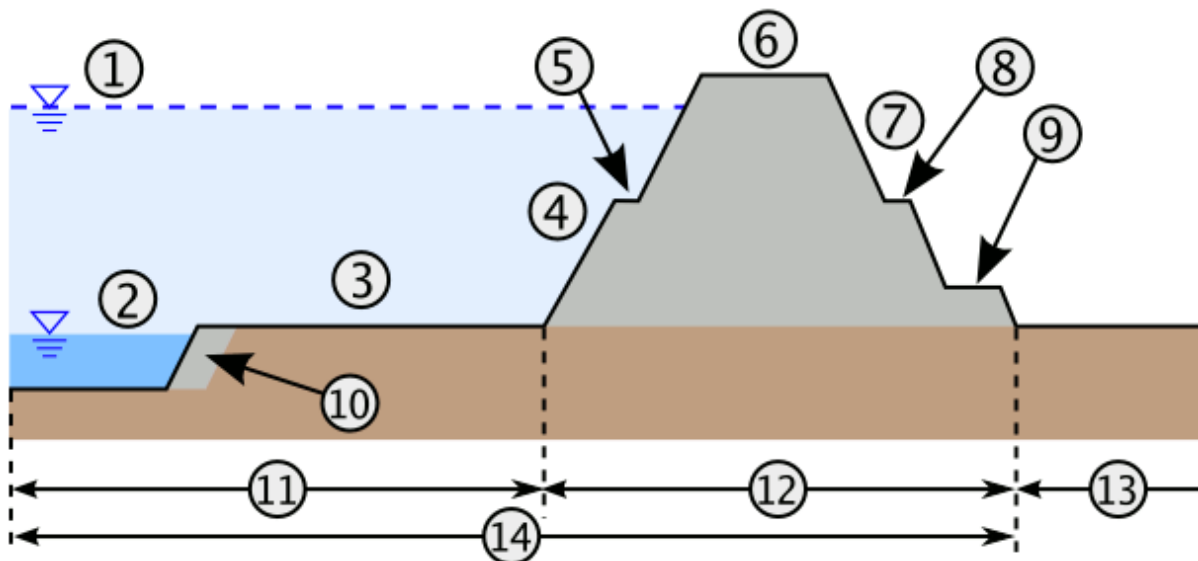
Typical Levee Cross-Section (Wikimedia Commons, 2013)
